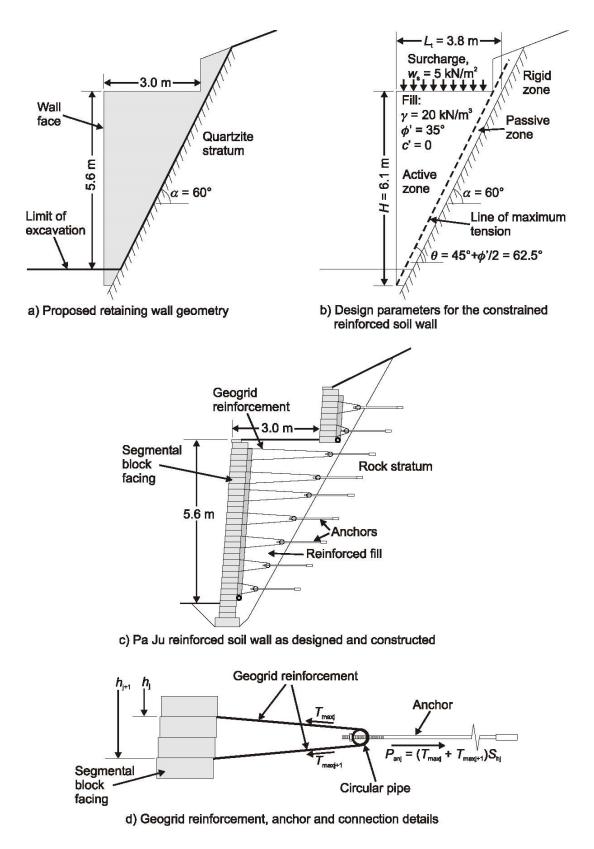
Details of Pa Ju reinforced segmental block retaining wall
